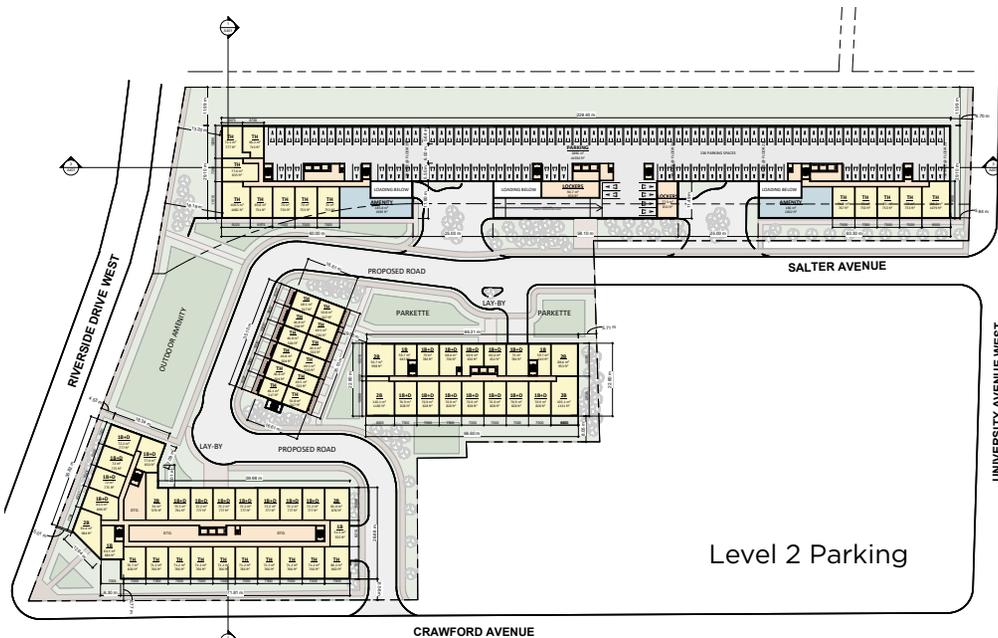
Parking Floor Plans prepared by Turner Fleischer
